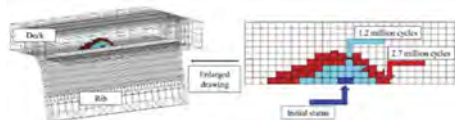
Fatigue crack propagation in the weld toe of deck plate.
